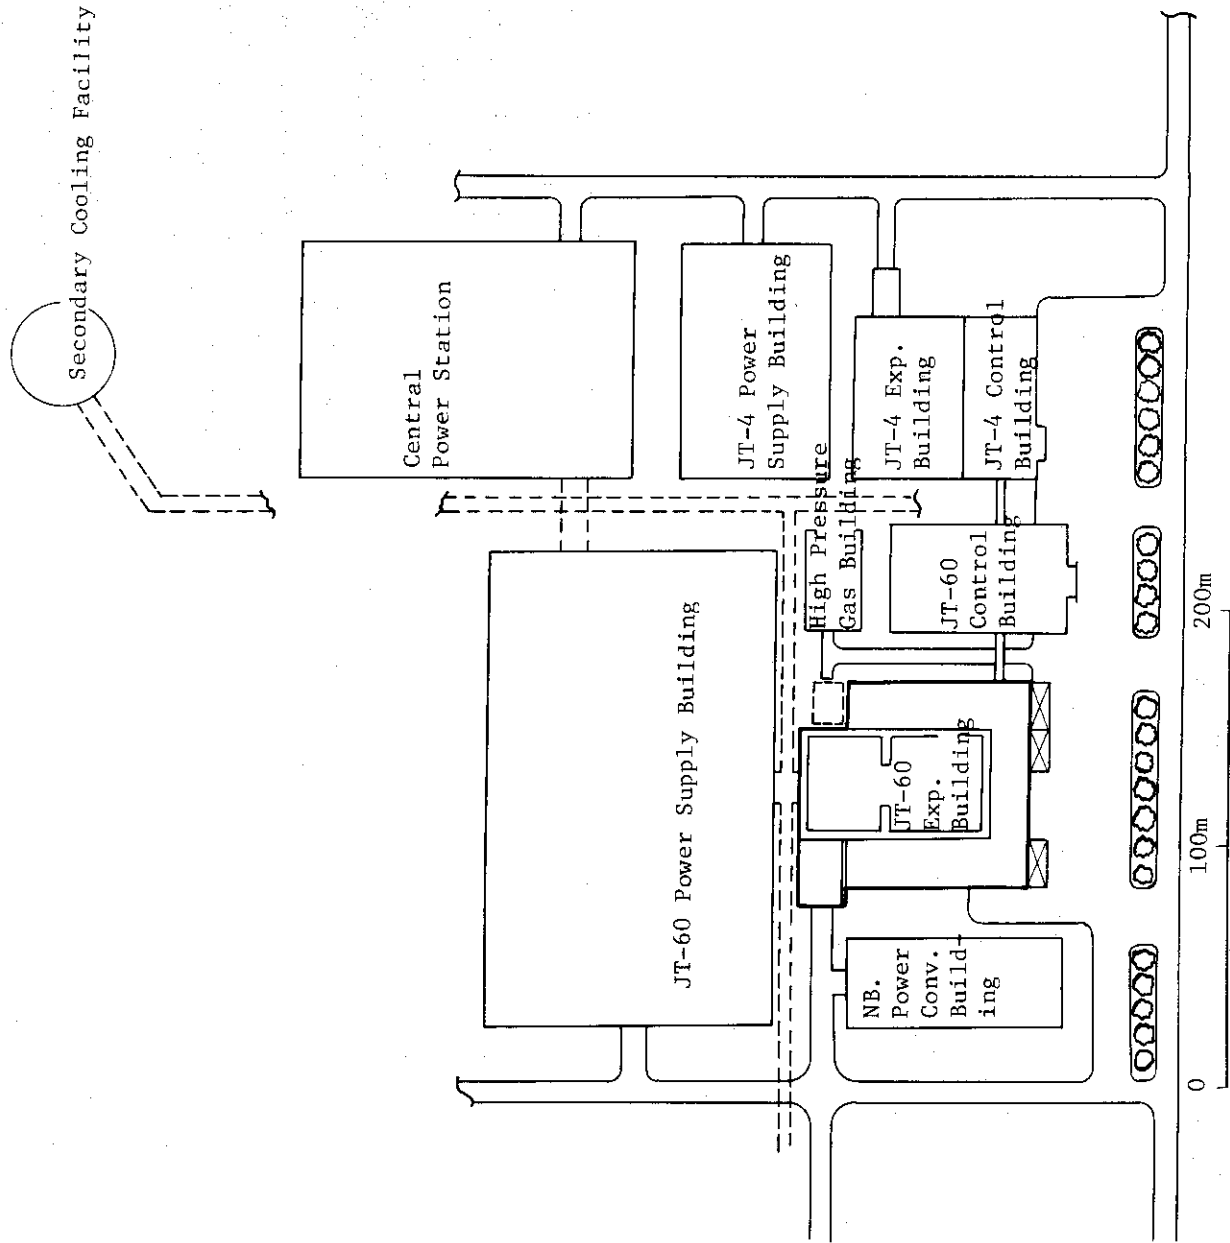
Site plan of JT-60 and JT-4
